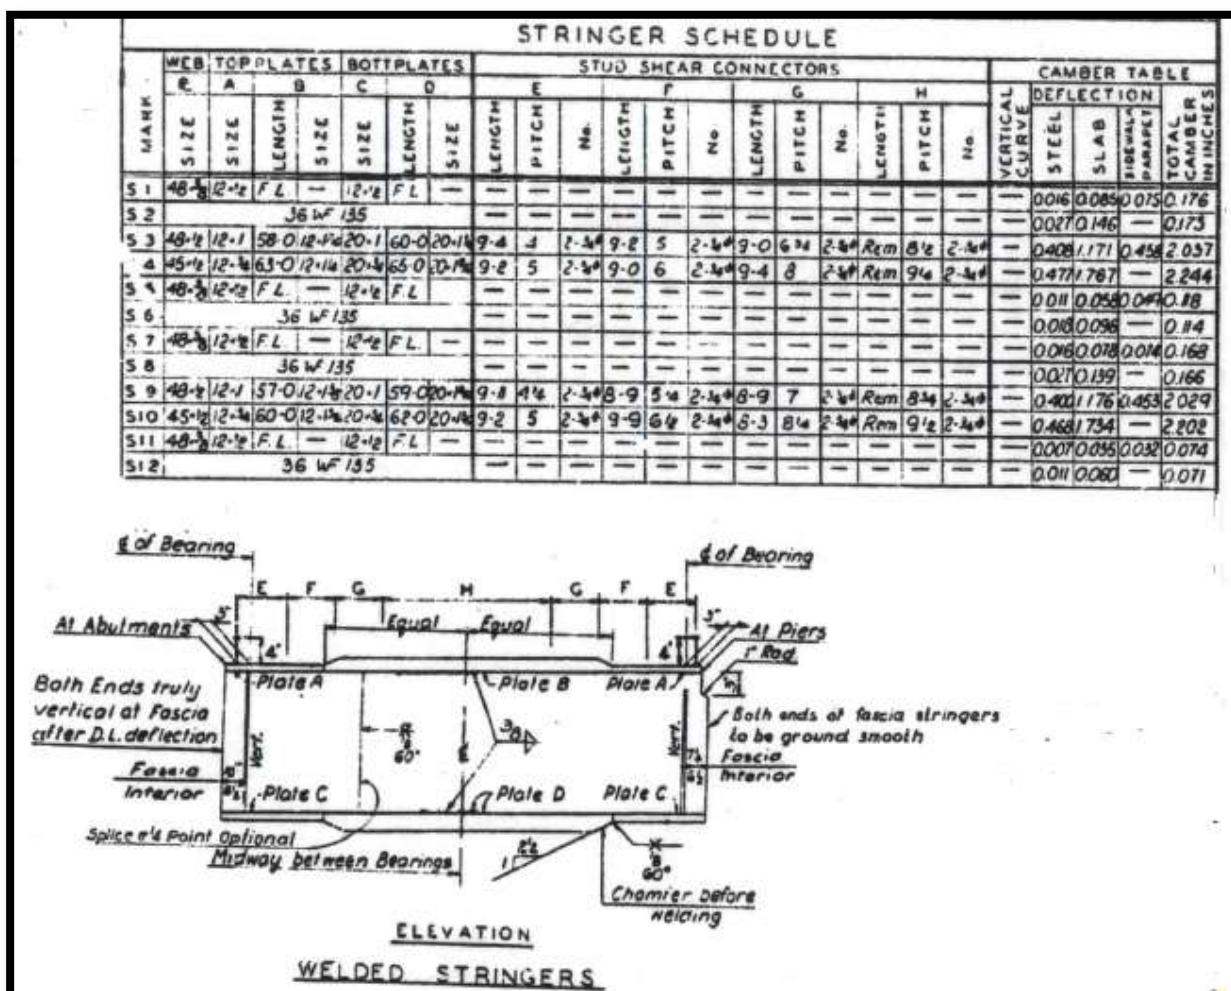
Original Girders (B8-B14) Cross-Sectional Properties
